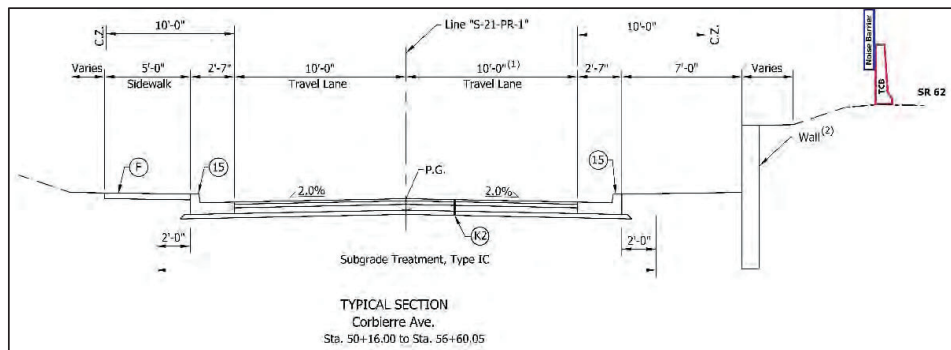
MSE wall, TCB, and attached noise barrier wall typical section between SR 62 and Corbierre Avenue east of Tekoppel Avenue
